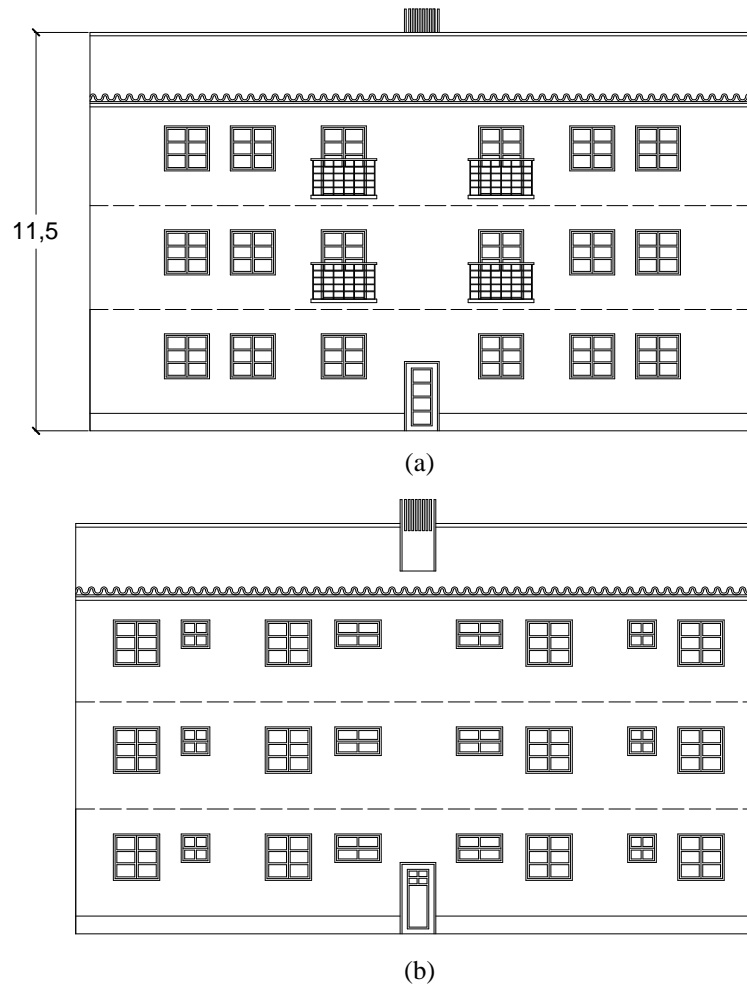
Elevation of the building: (a) Front elevation; (b) Rear elevation (Lamego 2014).
